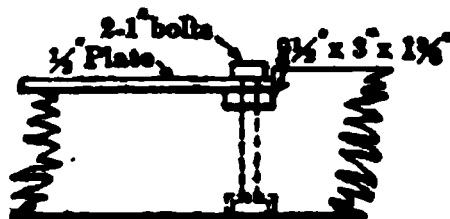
A. Alternate Detail of Joint 1, Fig. 8
